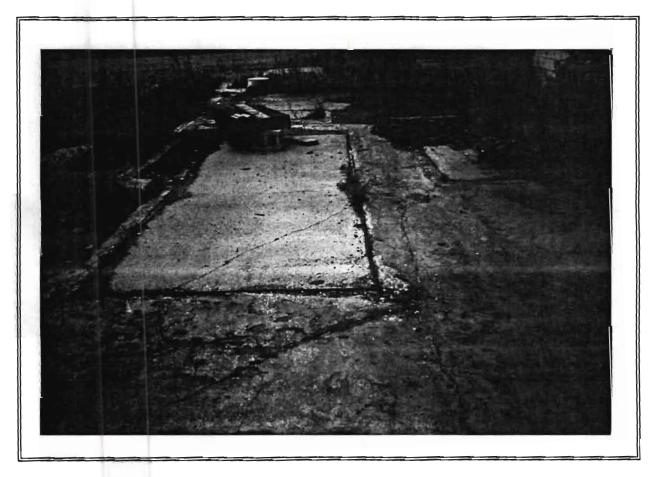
Former pits filled with concrete located near east end of warehouse building in vicinity of former lime storage room.
